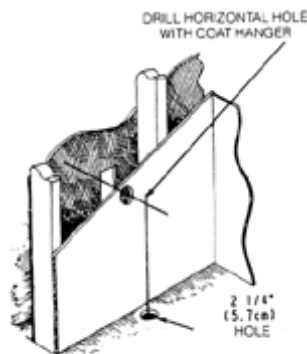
CLOSET WALL INSTALLATION IN AN EXISTING STRUCTURE
